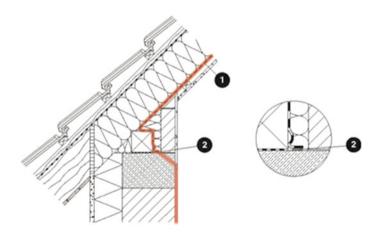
Eaves – between-rafter insulation: (1) air barrier, (2) adhesive
